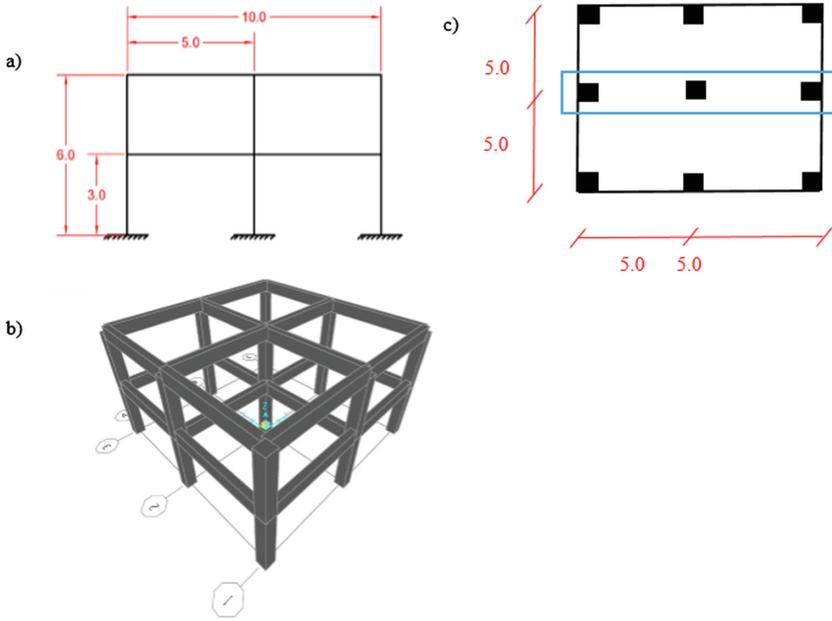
For the 2 storey building (a) Elevation. (b) Plan. (c) Isometric view.
